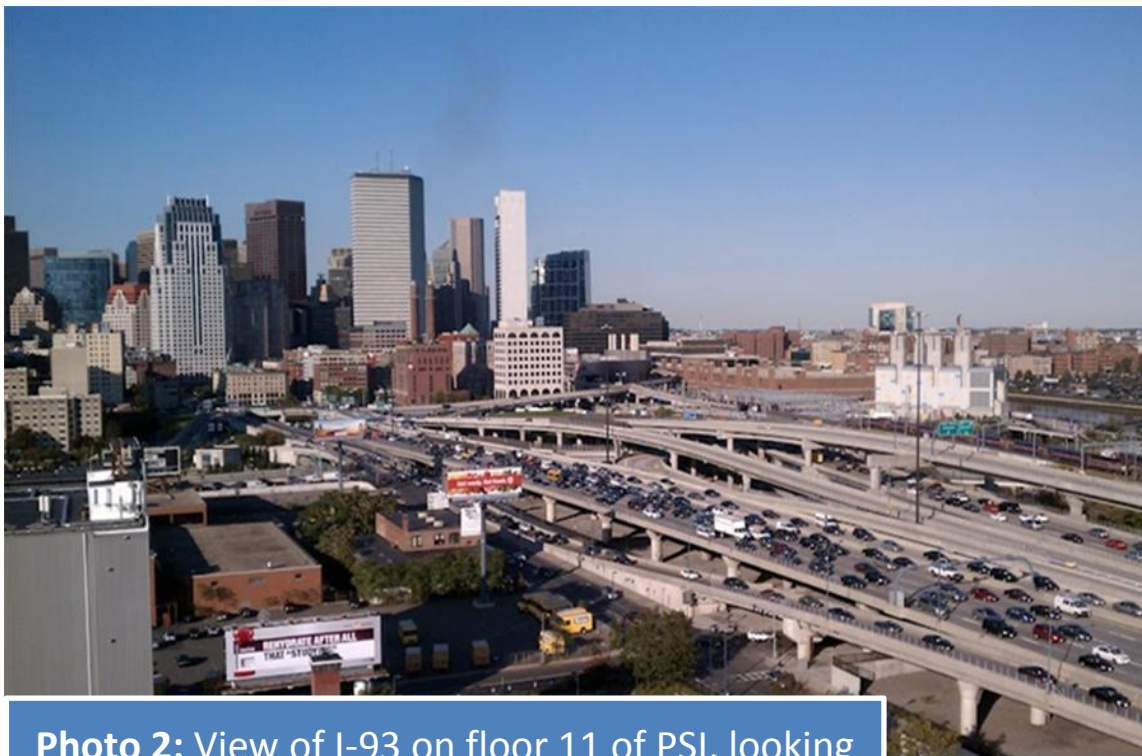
View of I-93 on floor 11 of PSI, looking northeast.
